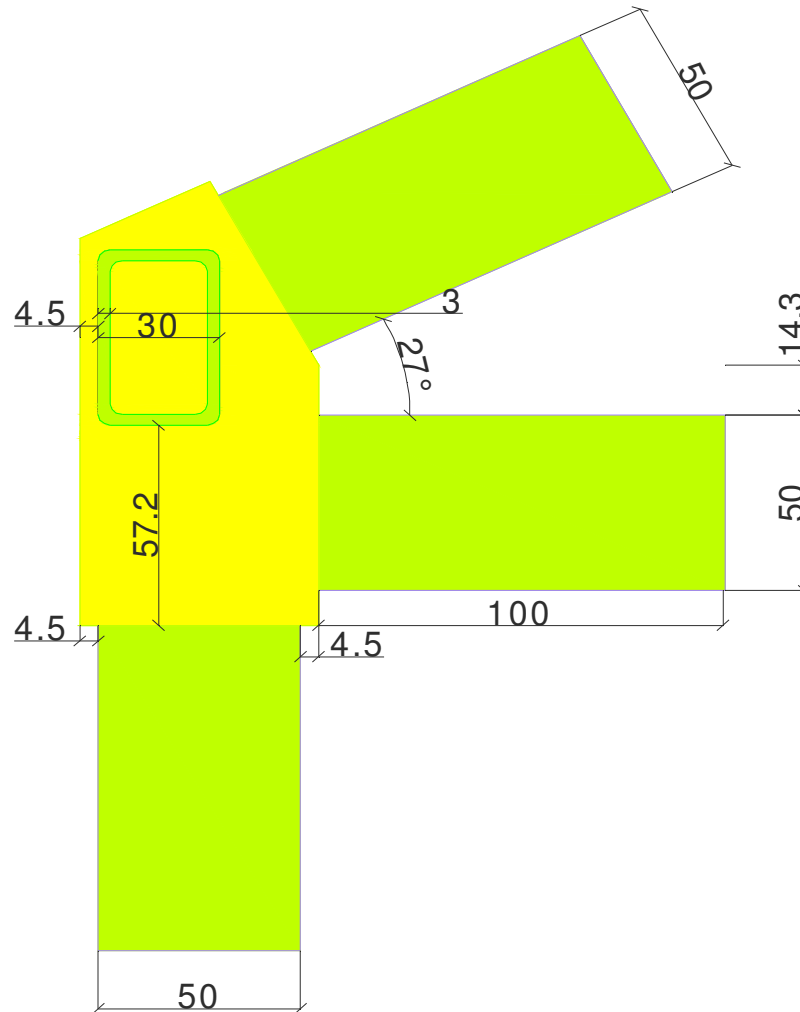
Connection element at column-beam joint (Dimensions are mm).
